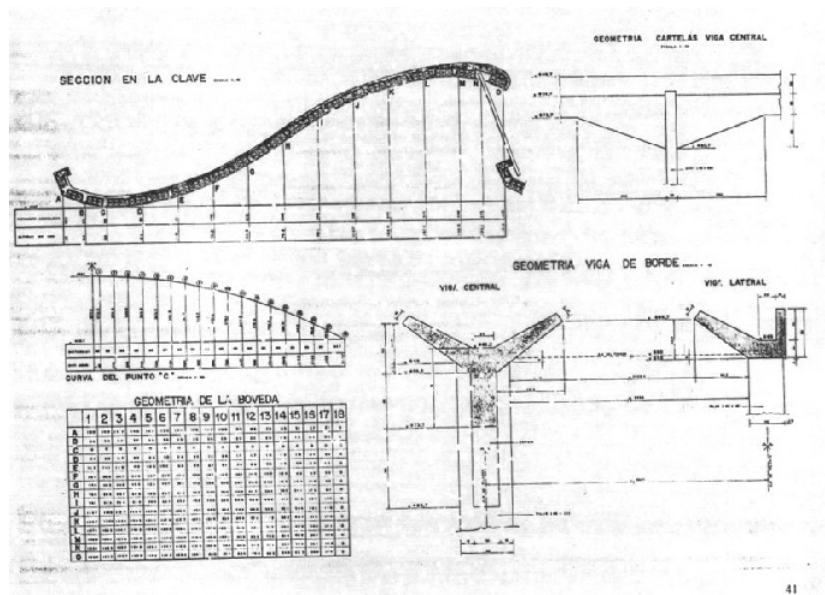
Section of the gausas vaults, beams and calculation tables by Dieste / Corte de las bóvedas gausas, vigas y cálculo de tablas, por Dieste.
